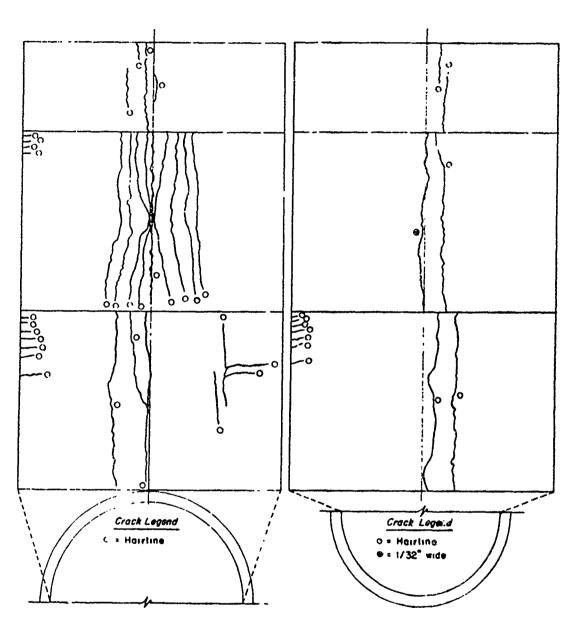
Crack survey of top half, developed; concrete Conduit 3.21.
